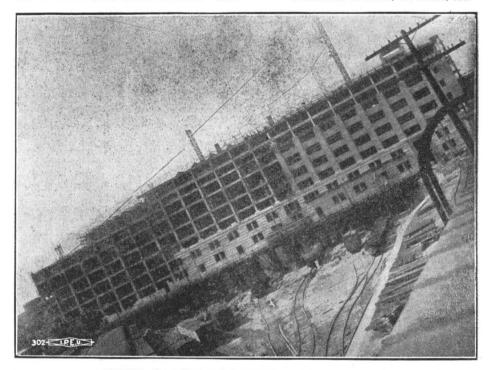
PHOTO OF NEW BEVO PLANT, LOOKING EAST.
